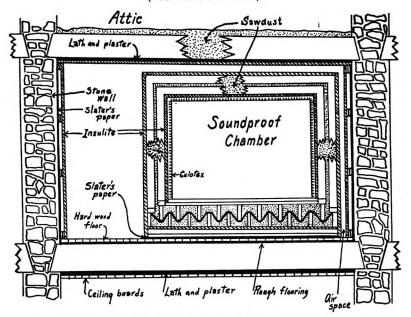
Cross-Section of the Soundproof Room (North-South dimension)
